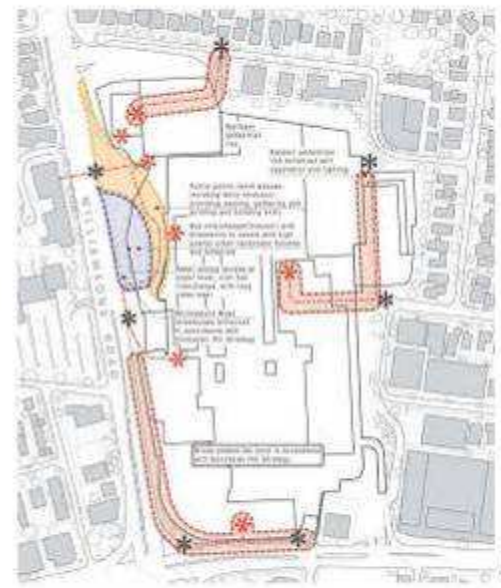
Proposed Public Realm and Landscaping. The plan shows the layout of the public realm and landscaping elements around the building complex.
